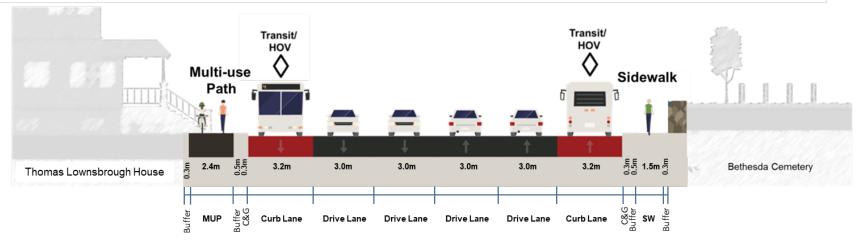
Alternative 1 - Reduced Lane Width with MUP and Sidewalk, Best Fit Approach
